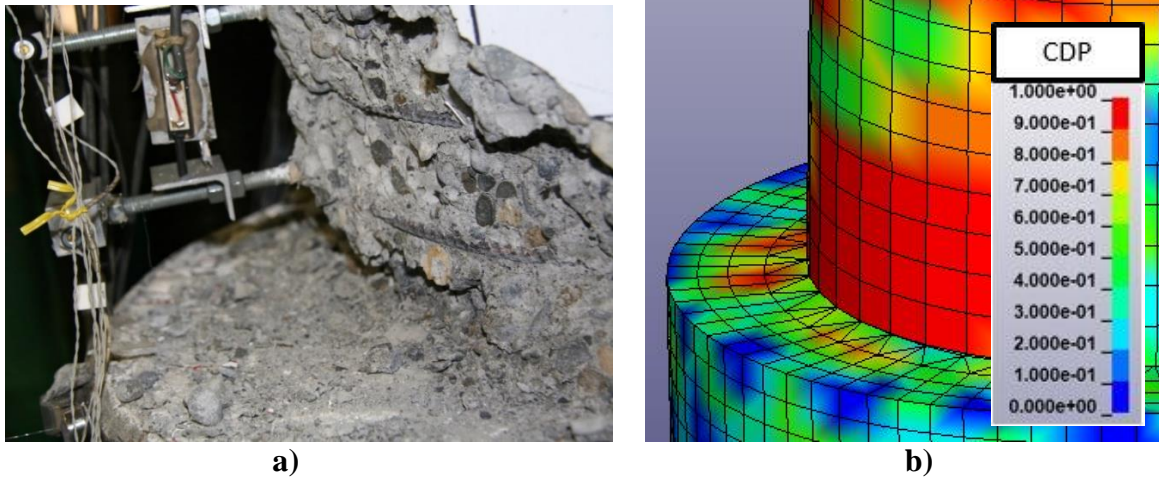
Specimen 30-21 Exposed Longitudinal Reinforcement and Compressive Damage at Base of Northern Column Face at 7.0% Drift: a) Observed and b) Simulated
